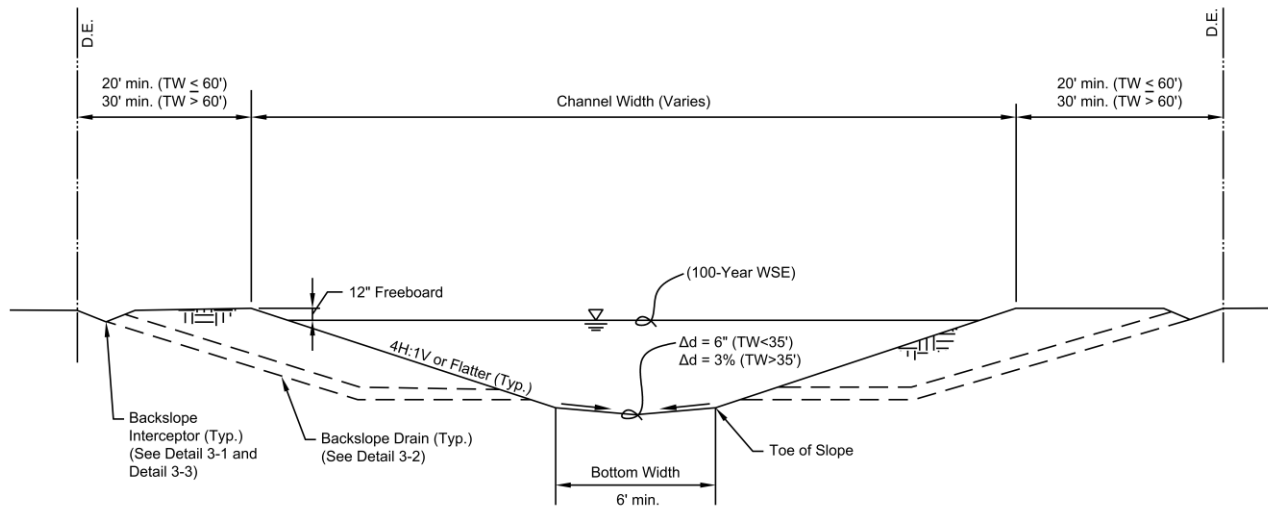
Typical Grass-Lined Trapezoidal Large Channel Section
